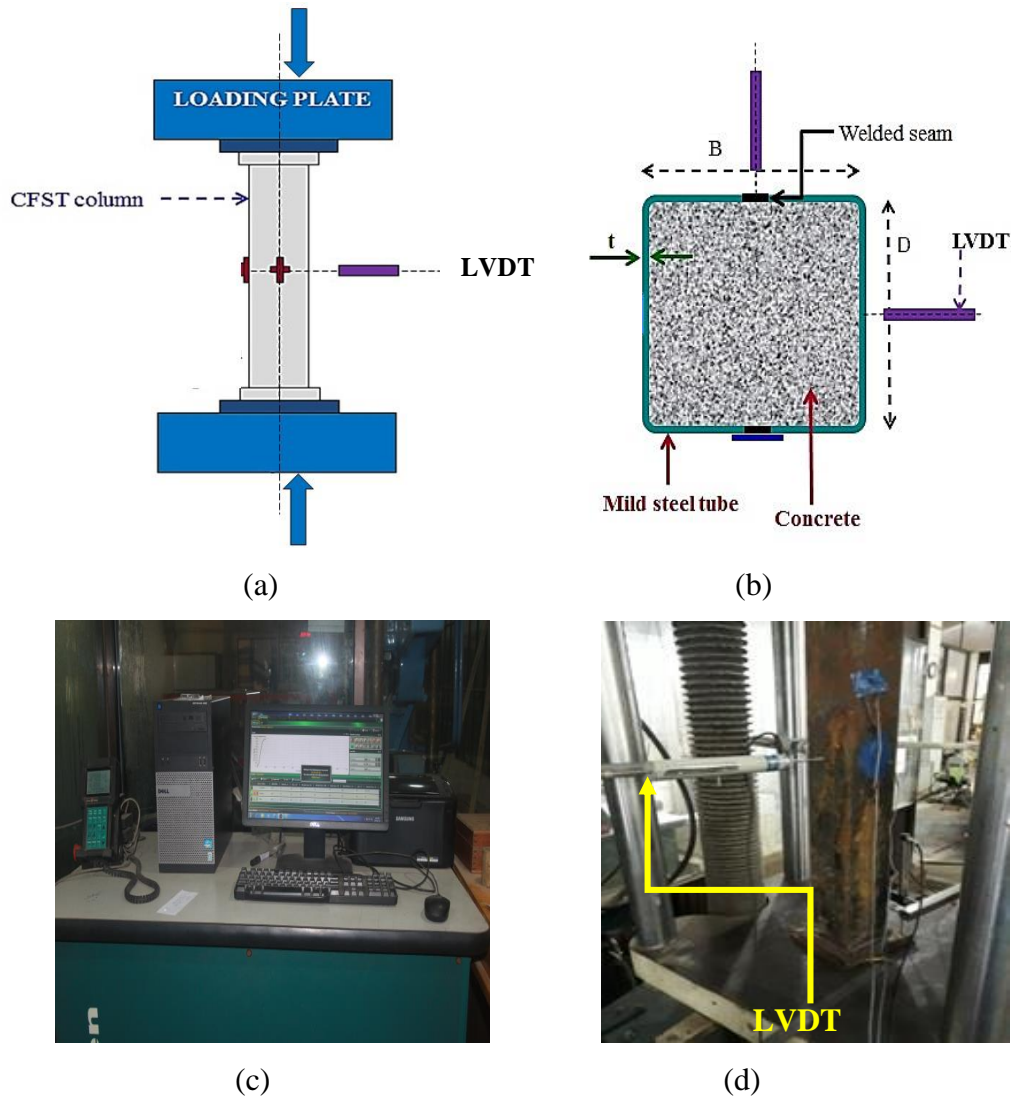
(a) Elevation of UTM setup (b) Cross section of the specimen
